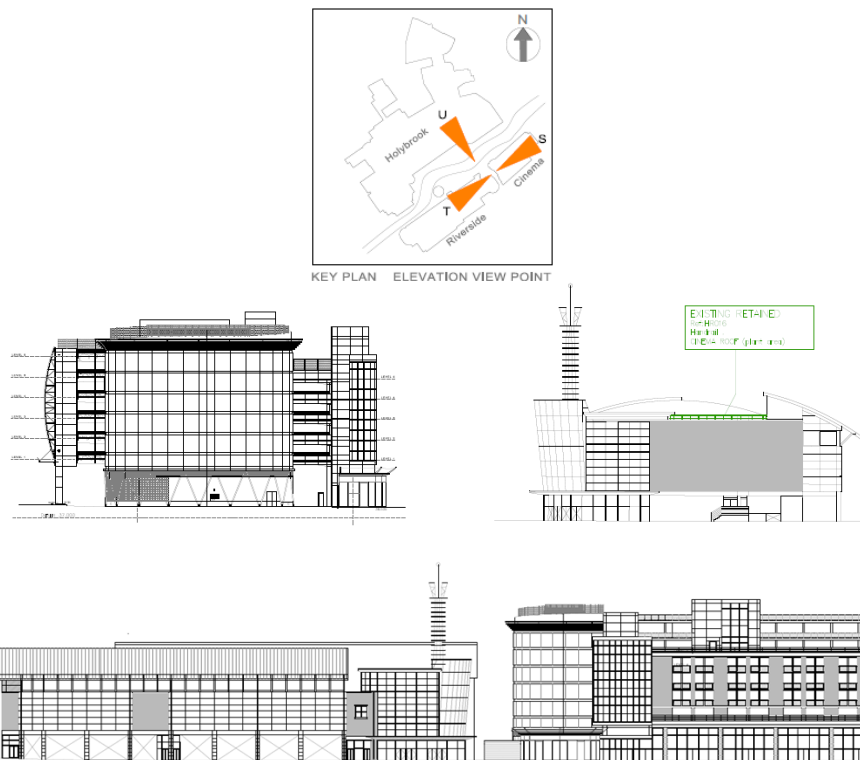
Existing north, east and west elevations of The Oracle buildings to the south of the Kennet visible from The Oracle riverside area (existing rails to be retained shown in green)
